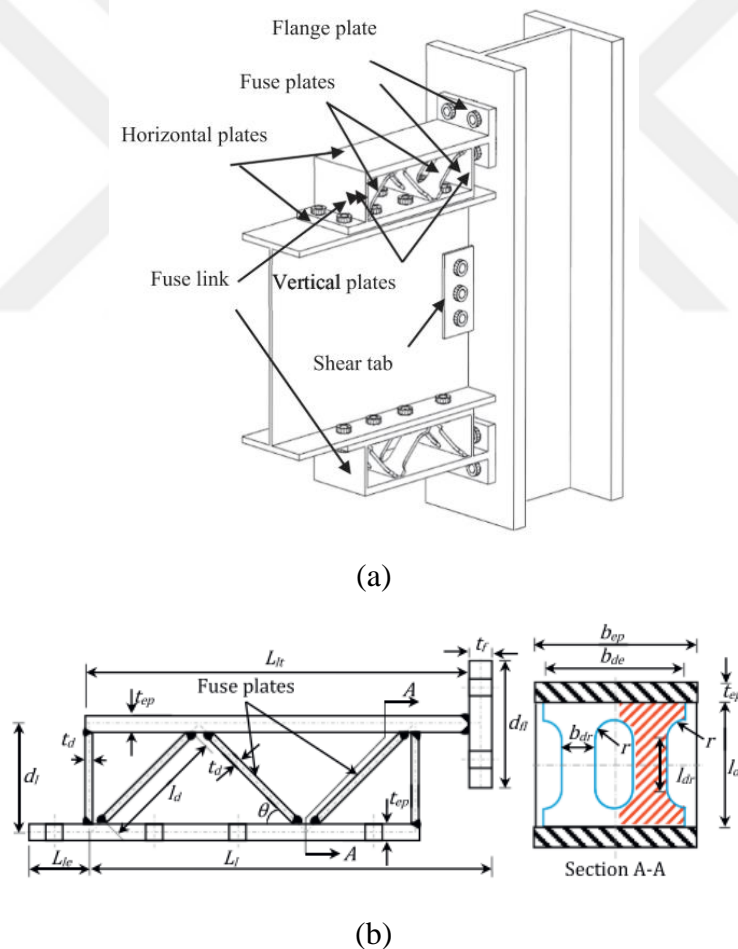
(a) Schematic sketch of proposed beam-column connection (b) Geometrical details of fuse link (Saravanan et al, 2021)
